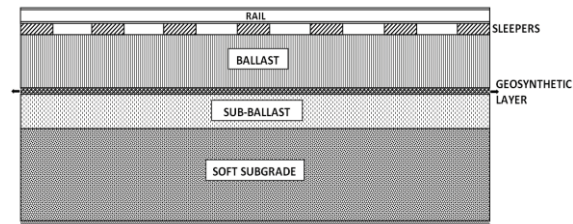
Typical layout of a geosynthetic reinforced railway track
